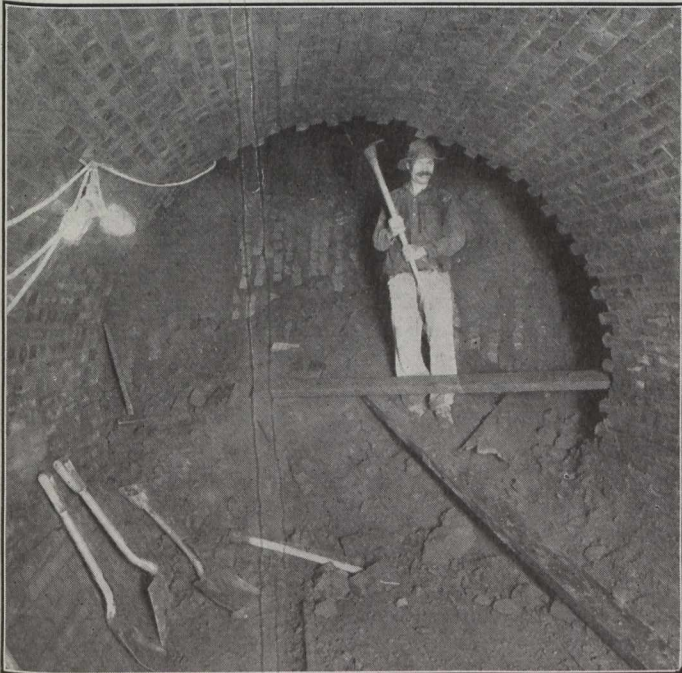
In the Keele Street Section, South of Bloor Street, Showing the Nature of Excavation Encountered in This Particular Section.
